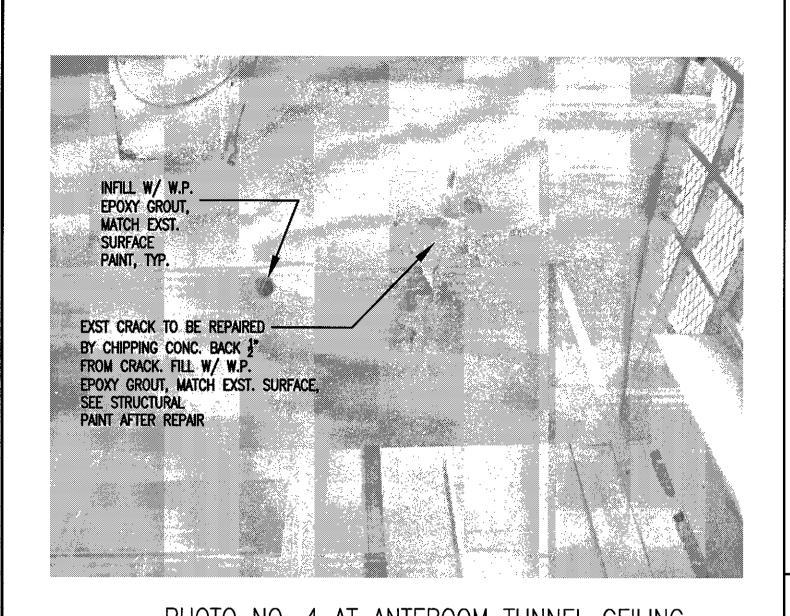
AT ANTEROOM TUNNEL CEILING
